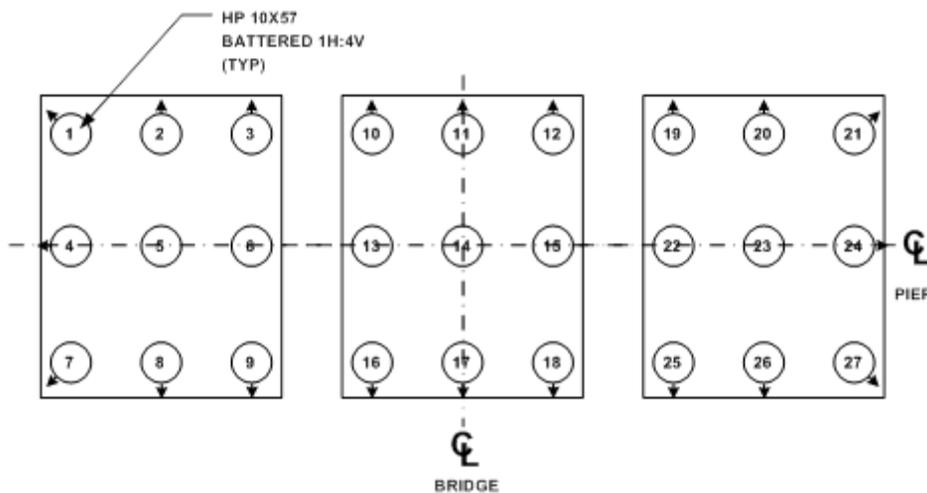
Track 1 Example 4: Pile arrangement at pile piers
